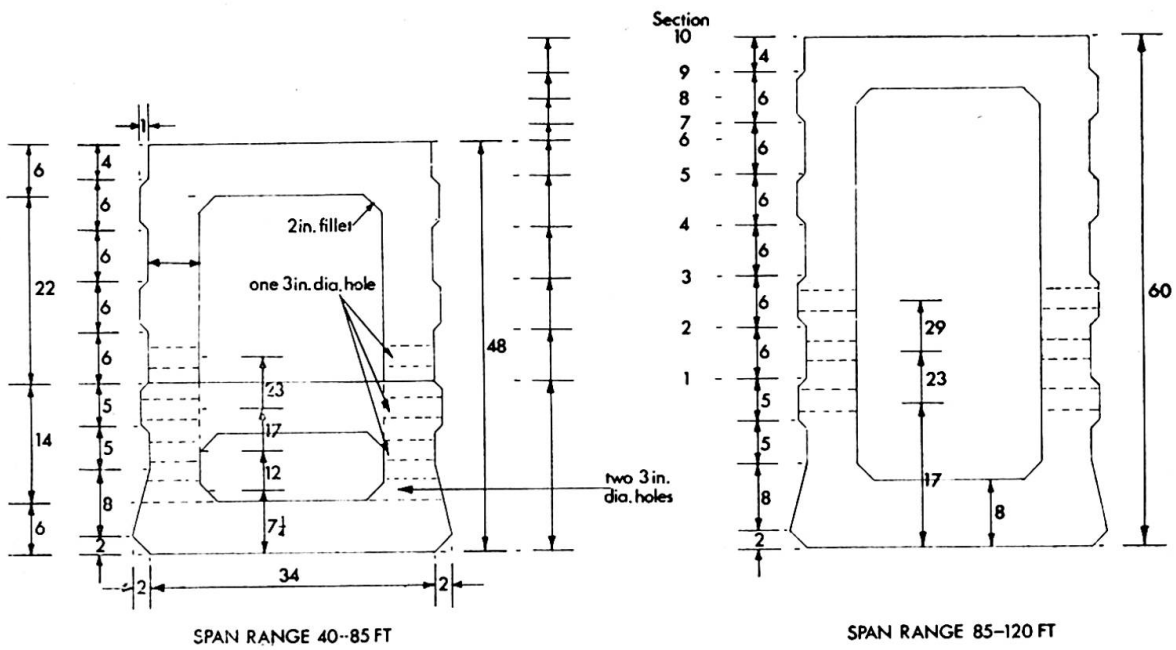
Standard box sections for bridges of span 40 - 120 ft.
